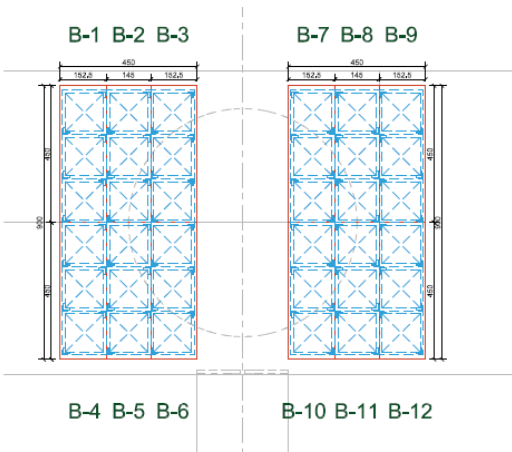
Layout plan for a column of the high building, showing the individual VHS bearings
